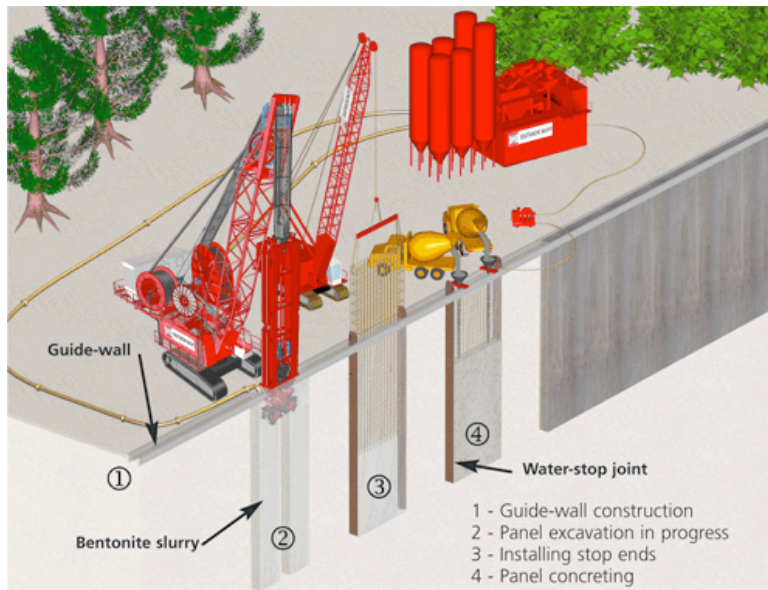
Diaphragm Wall construction (courtesy Bachy-Soltenache)
